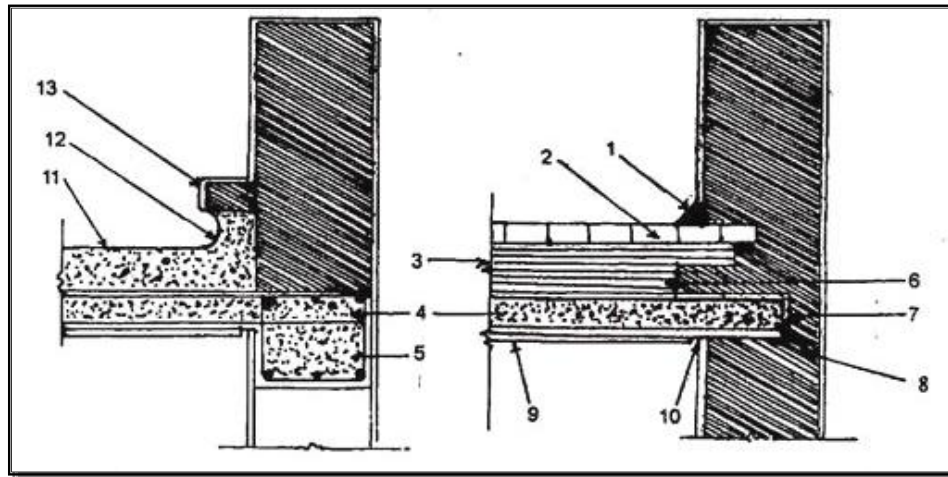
Horizontal crack at the junction of roof slab and masonry wall support
